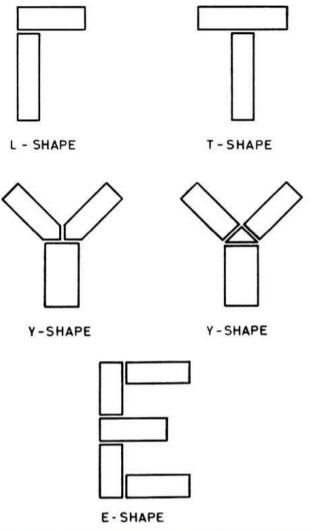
TYPICAL SHAPES OF BUILDING WITH SEPARATION SECTIONS
